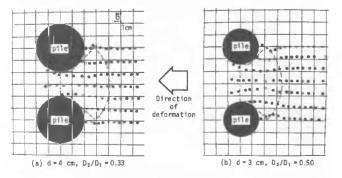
Plan View of Deformation Behavior of Soil around Piles
